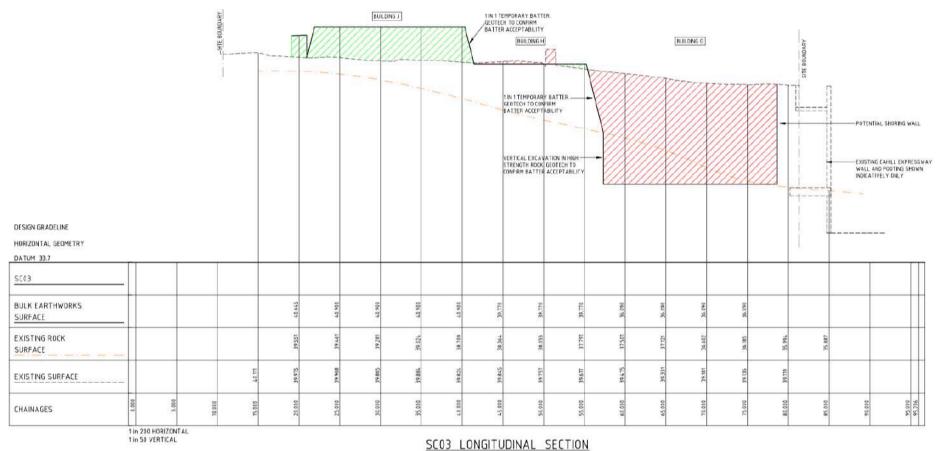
Bulk Excavation Works- SC03 Longitudinal Section (Sheet 2). Excavation depth for Building G visible in right, extending in some areas into bedrock (Source: Bonacci Group, DWGC016, 19.12.19)
